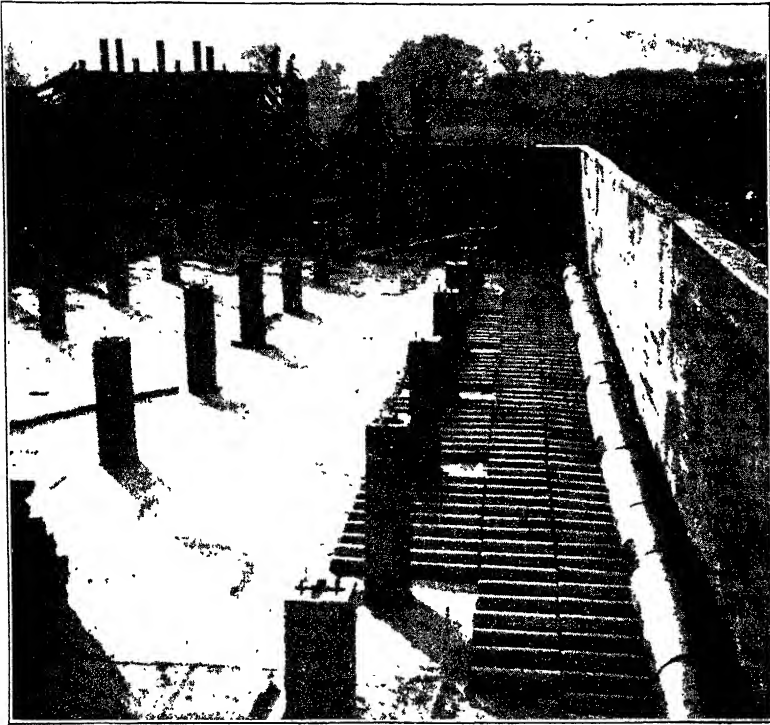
Interior of Sprinkling Filter Showing Underdrains Partly Laid
